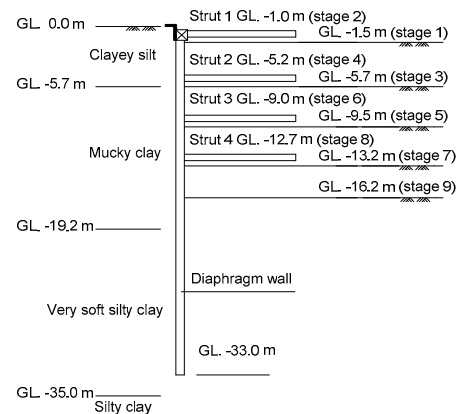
Excavation and subsurface soil profiles of the N2 excavation
